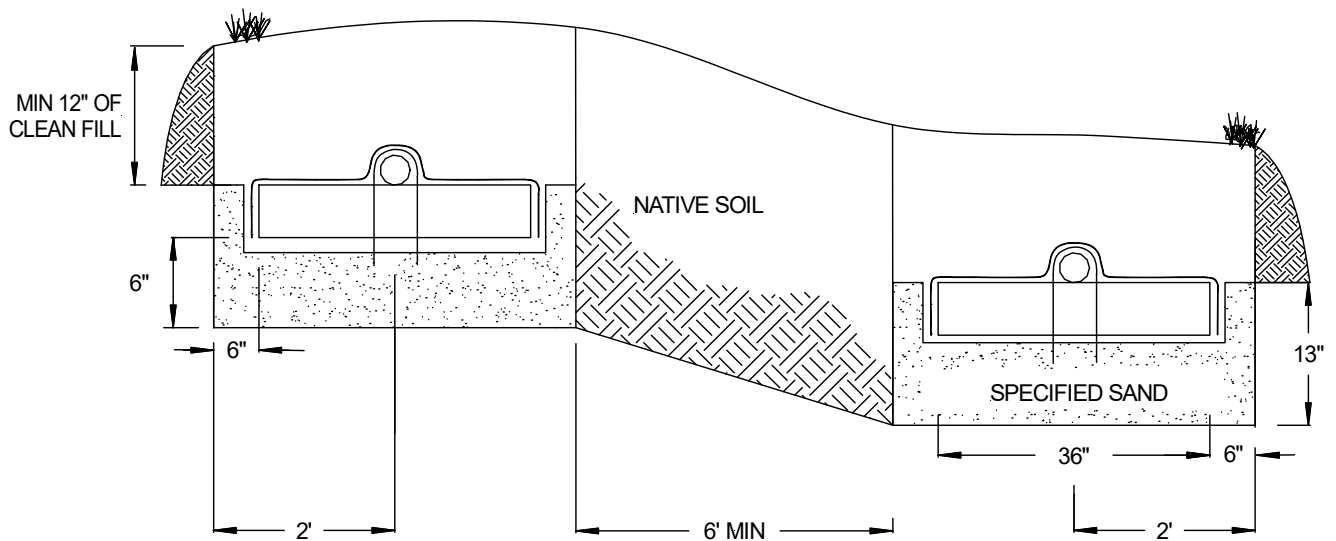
SECTION VIEW – 600 GPD – TRENCH SYSTEM – SLOPING SITE
